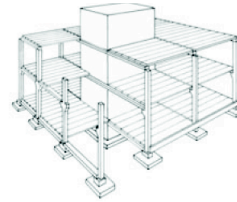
Principle of a multi-storey framed building using precast concrete columns, beams and floor elements. The in situ concrete core stabilises the building by resisting the horizontal forces.
